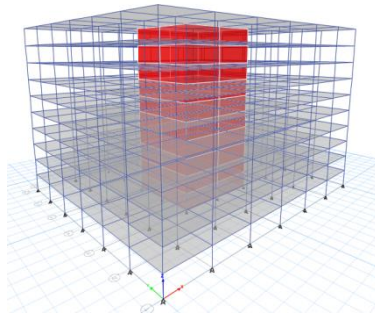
3D Plane of Model-03[SWP-02]
